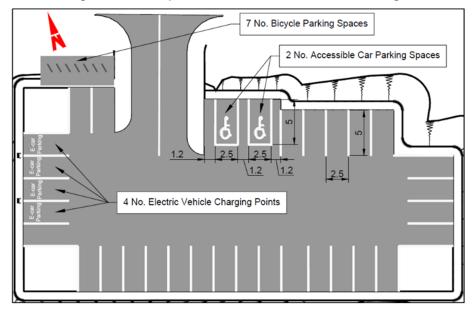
New Off-street Car Park Proposed Parking Provisions
